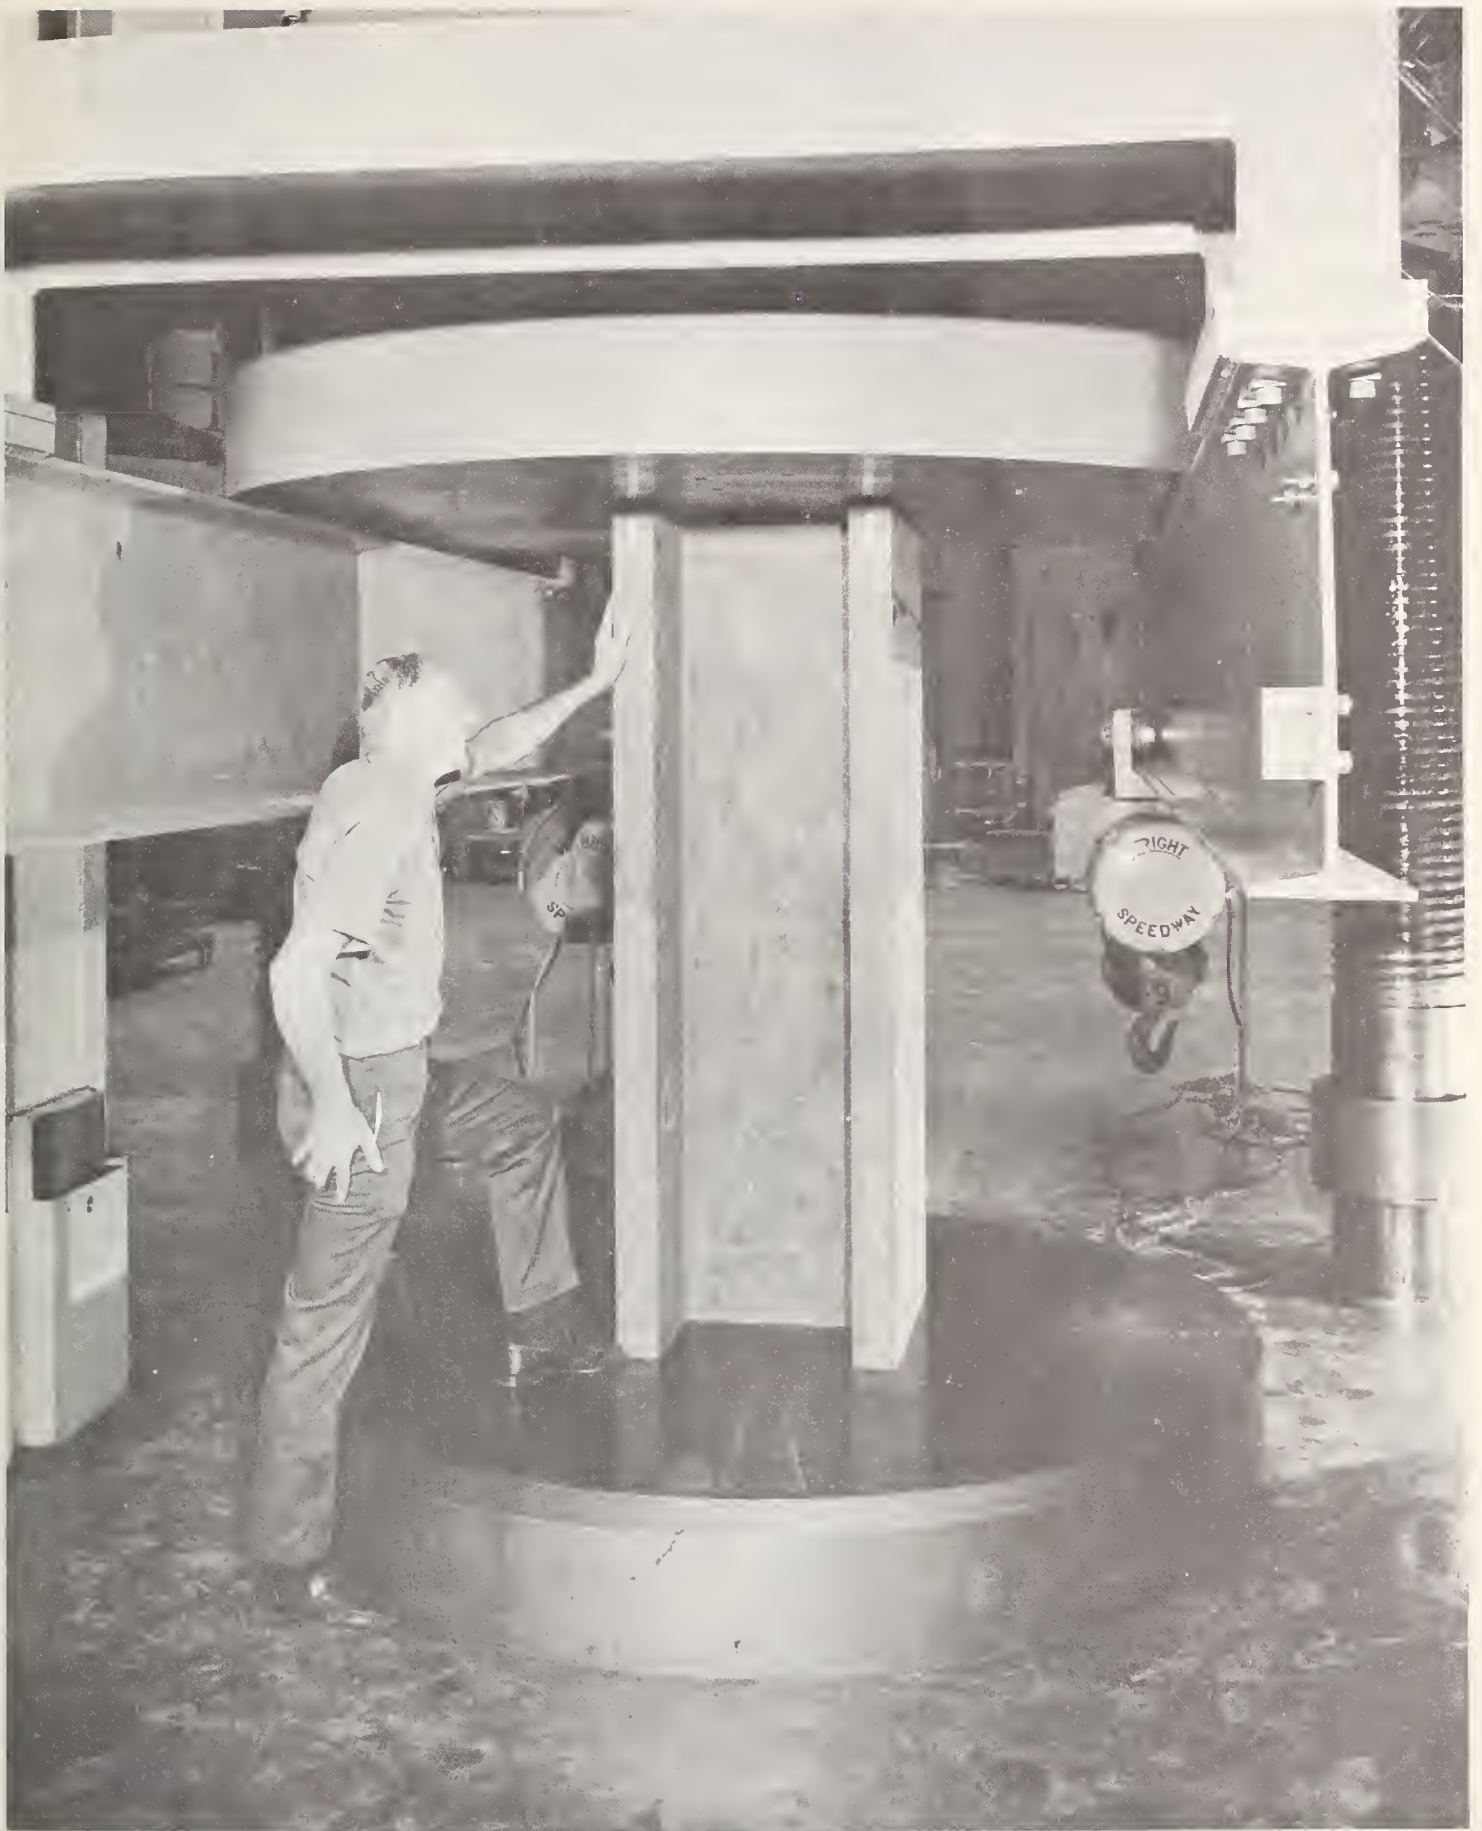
Heavy stub column in the 12,000,000 lbf capacity universal testing machine.
